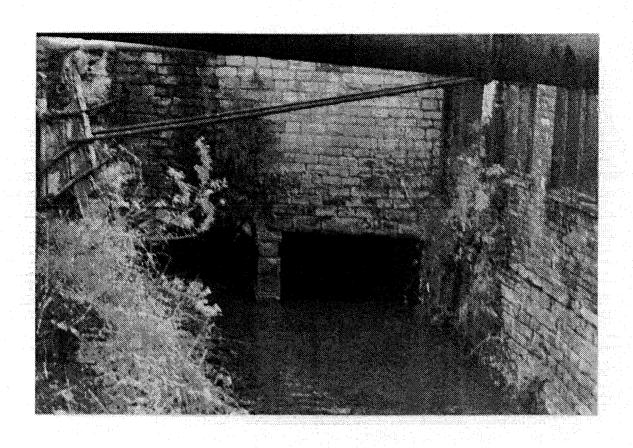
CULVERT No.26 (Inlet above - Outlet below)
